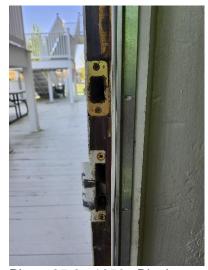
1850s Block Door Jamb, Adjacent Rm 106
